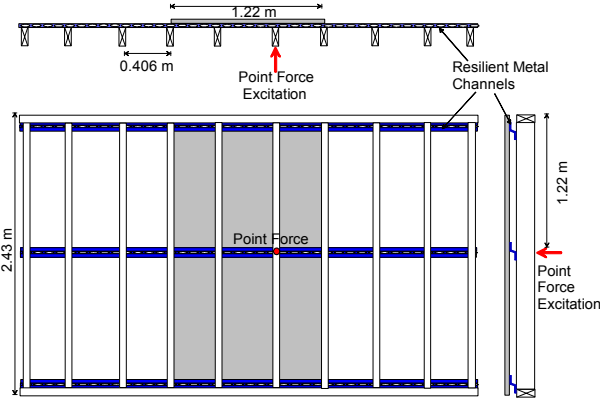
Sketch showing wall framing and the single sheet of gypsum board mounted on RC's.
